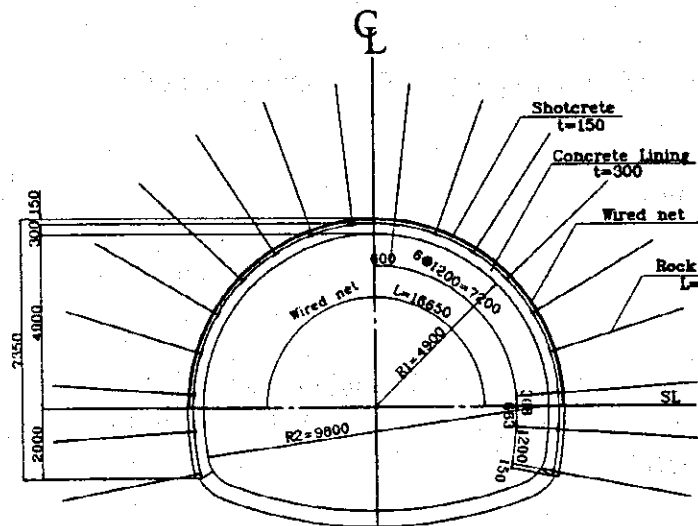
Typical Cross Section of C-1 Route Tunnel (Soft Rock)
